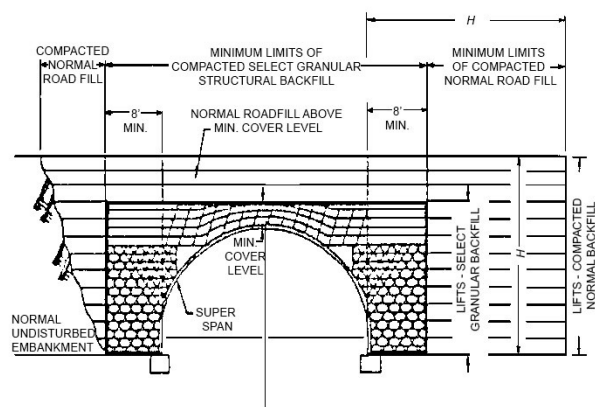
Typical Structural Backfill Envelope and Zone of Structure Influence
